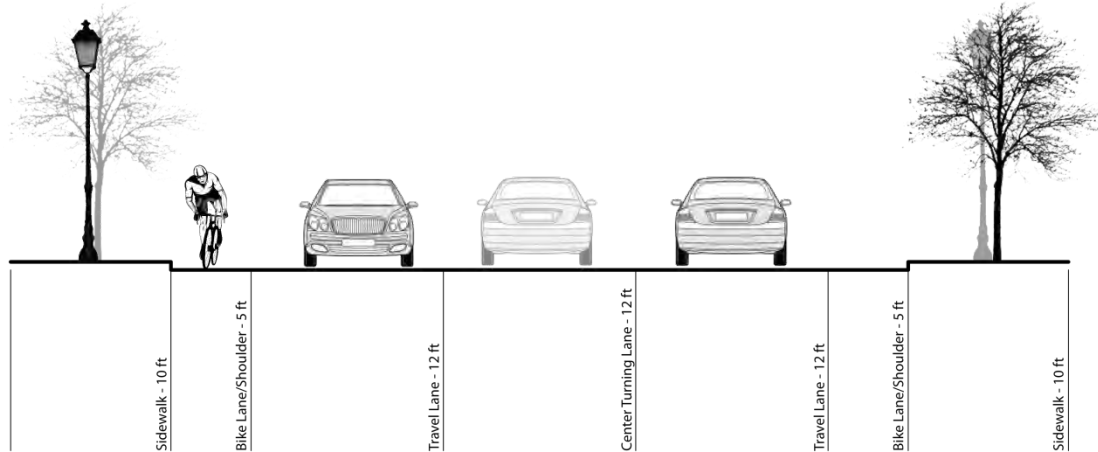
Cross-section through Bath Road in the proposed Bath Road Village 3 District. Improvements would be within the right-of-way creating a safe, attractive and unified design.
